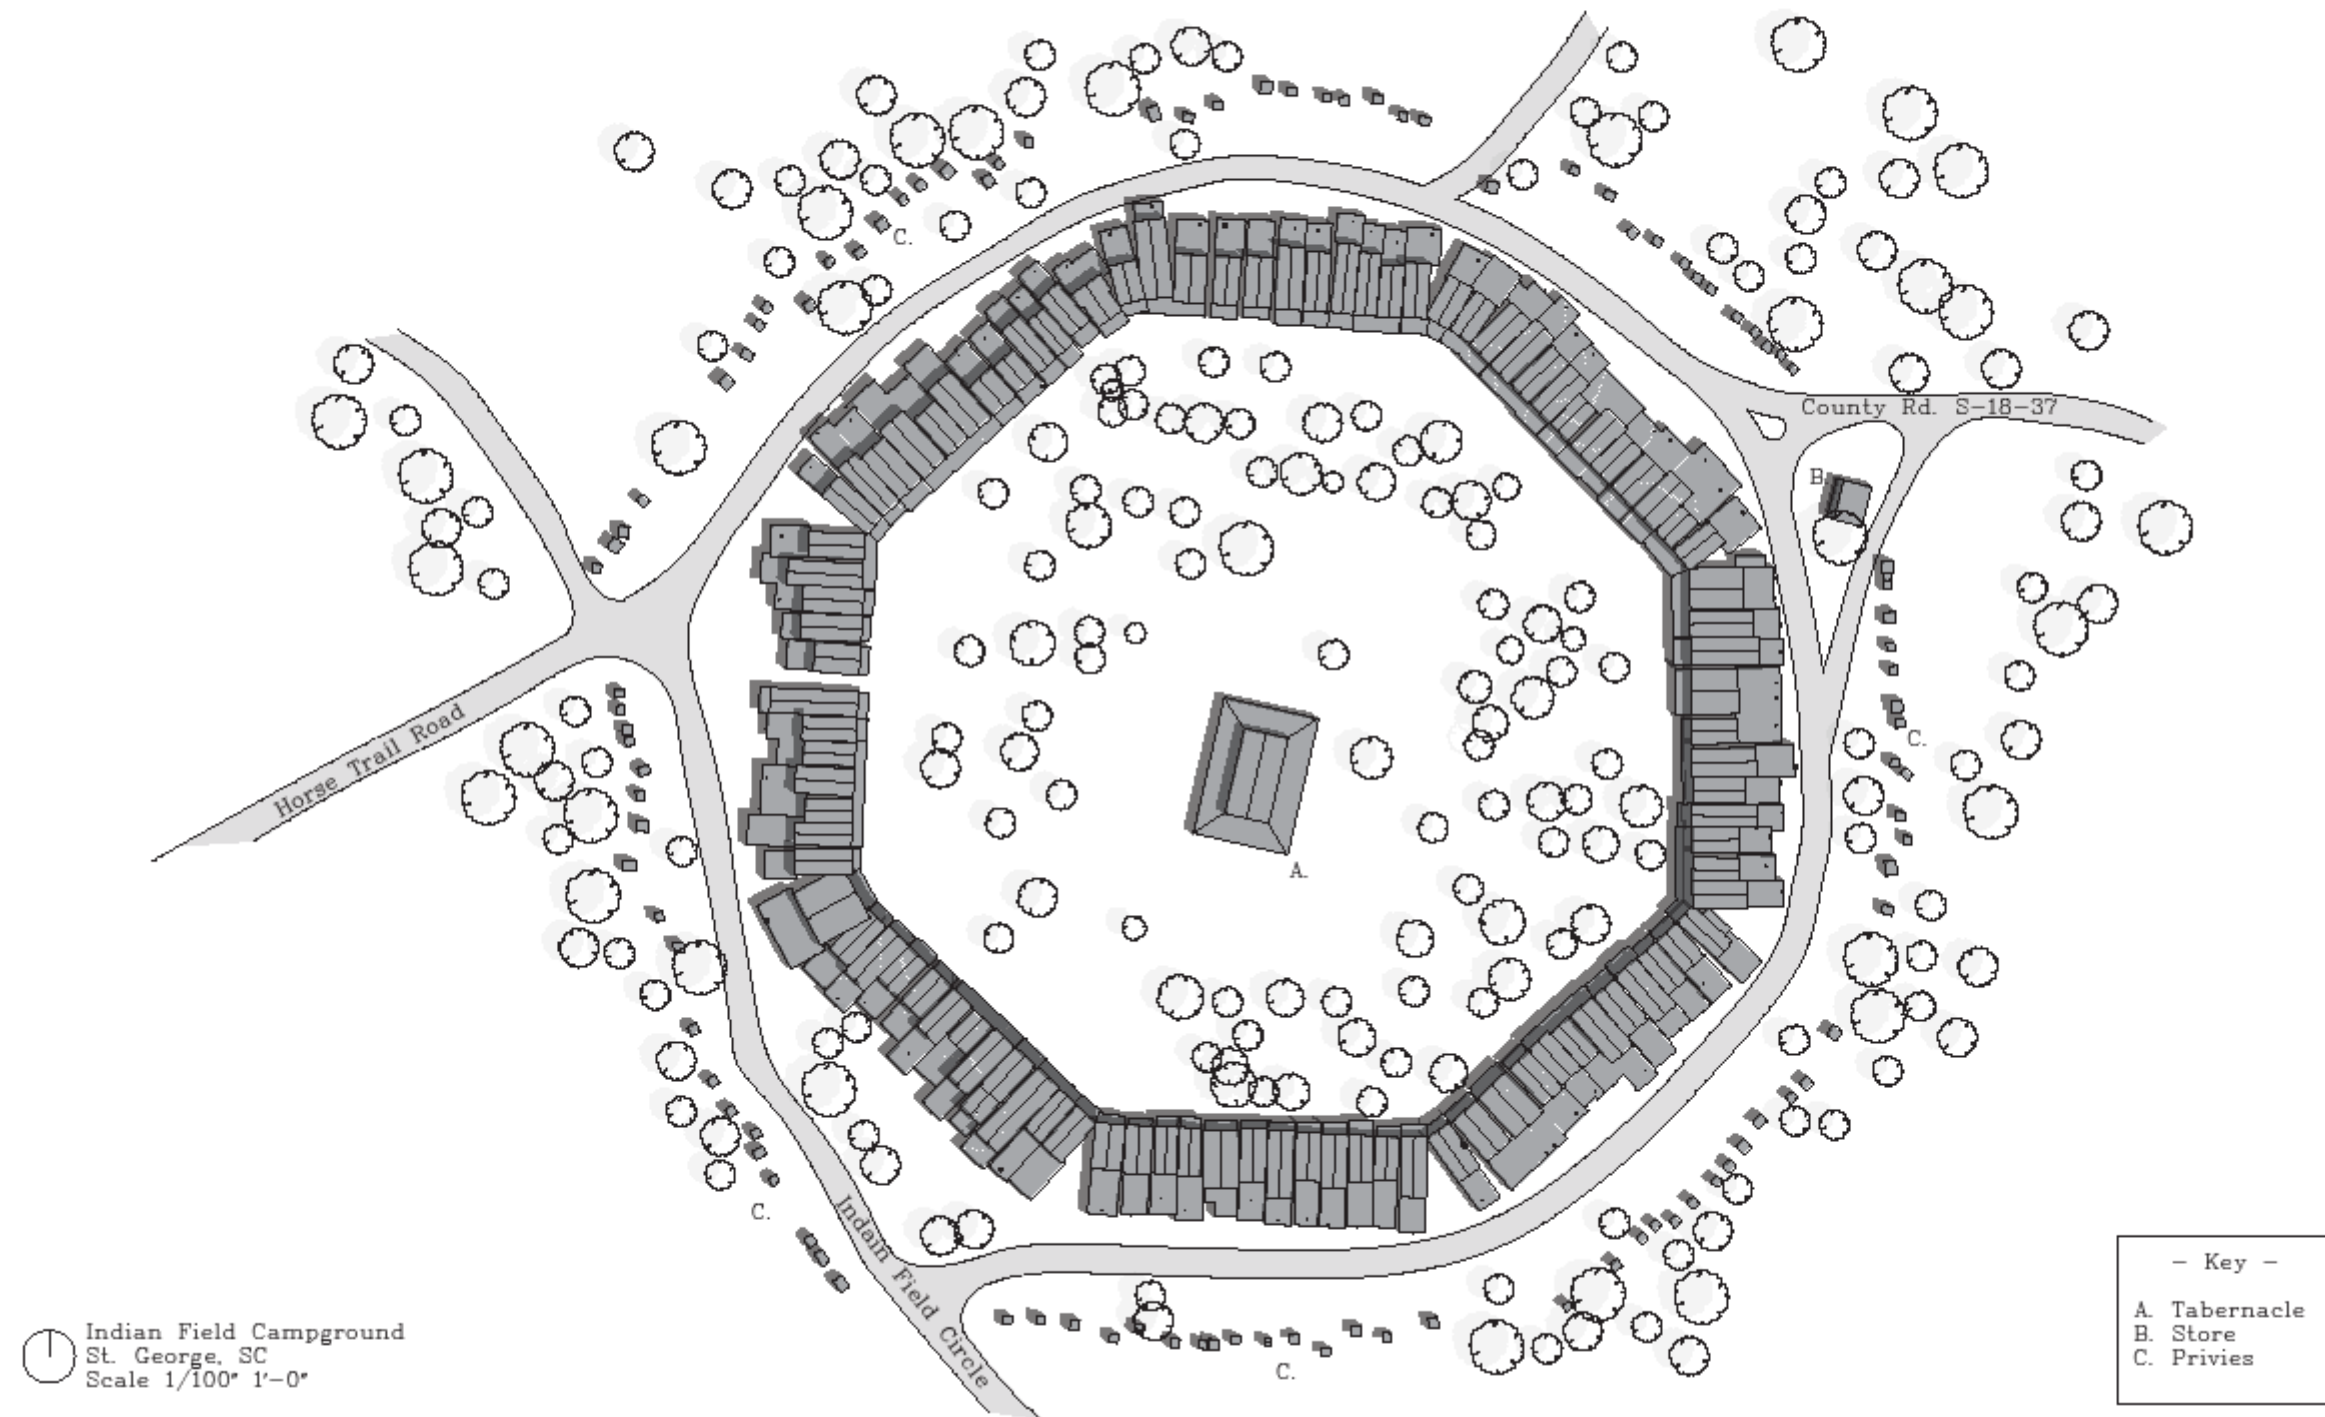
Site plan of Indian Field Campground. Illustration by author.
